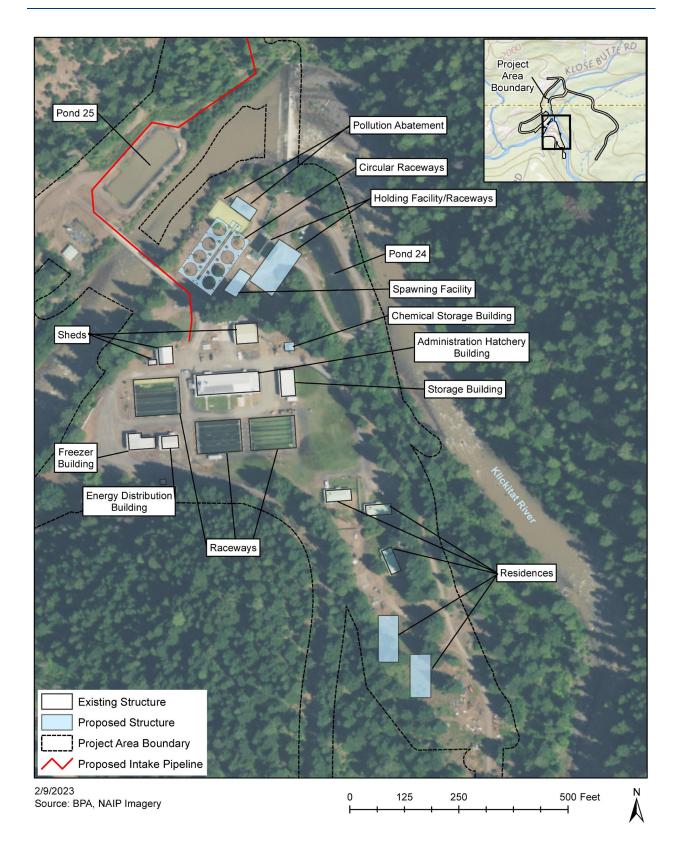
Proposed Action: Hatchery Upgrades Construction Details
